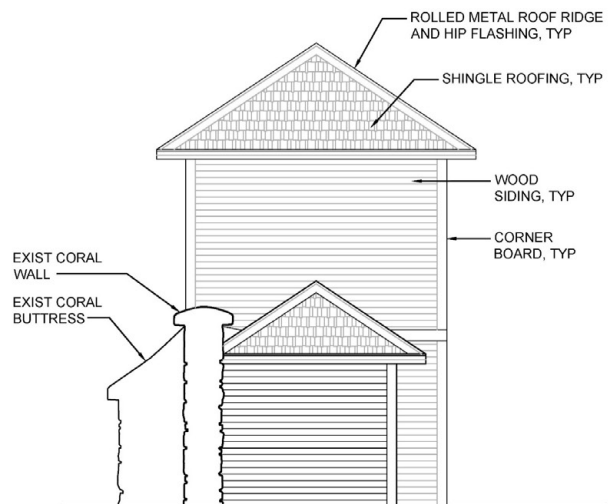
Old Lahaina Prison Gatehouse Olowalu Elevation.
